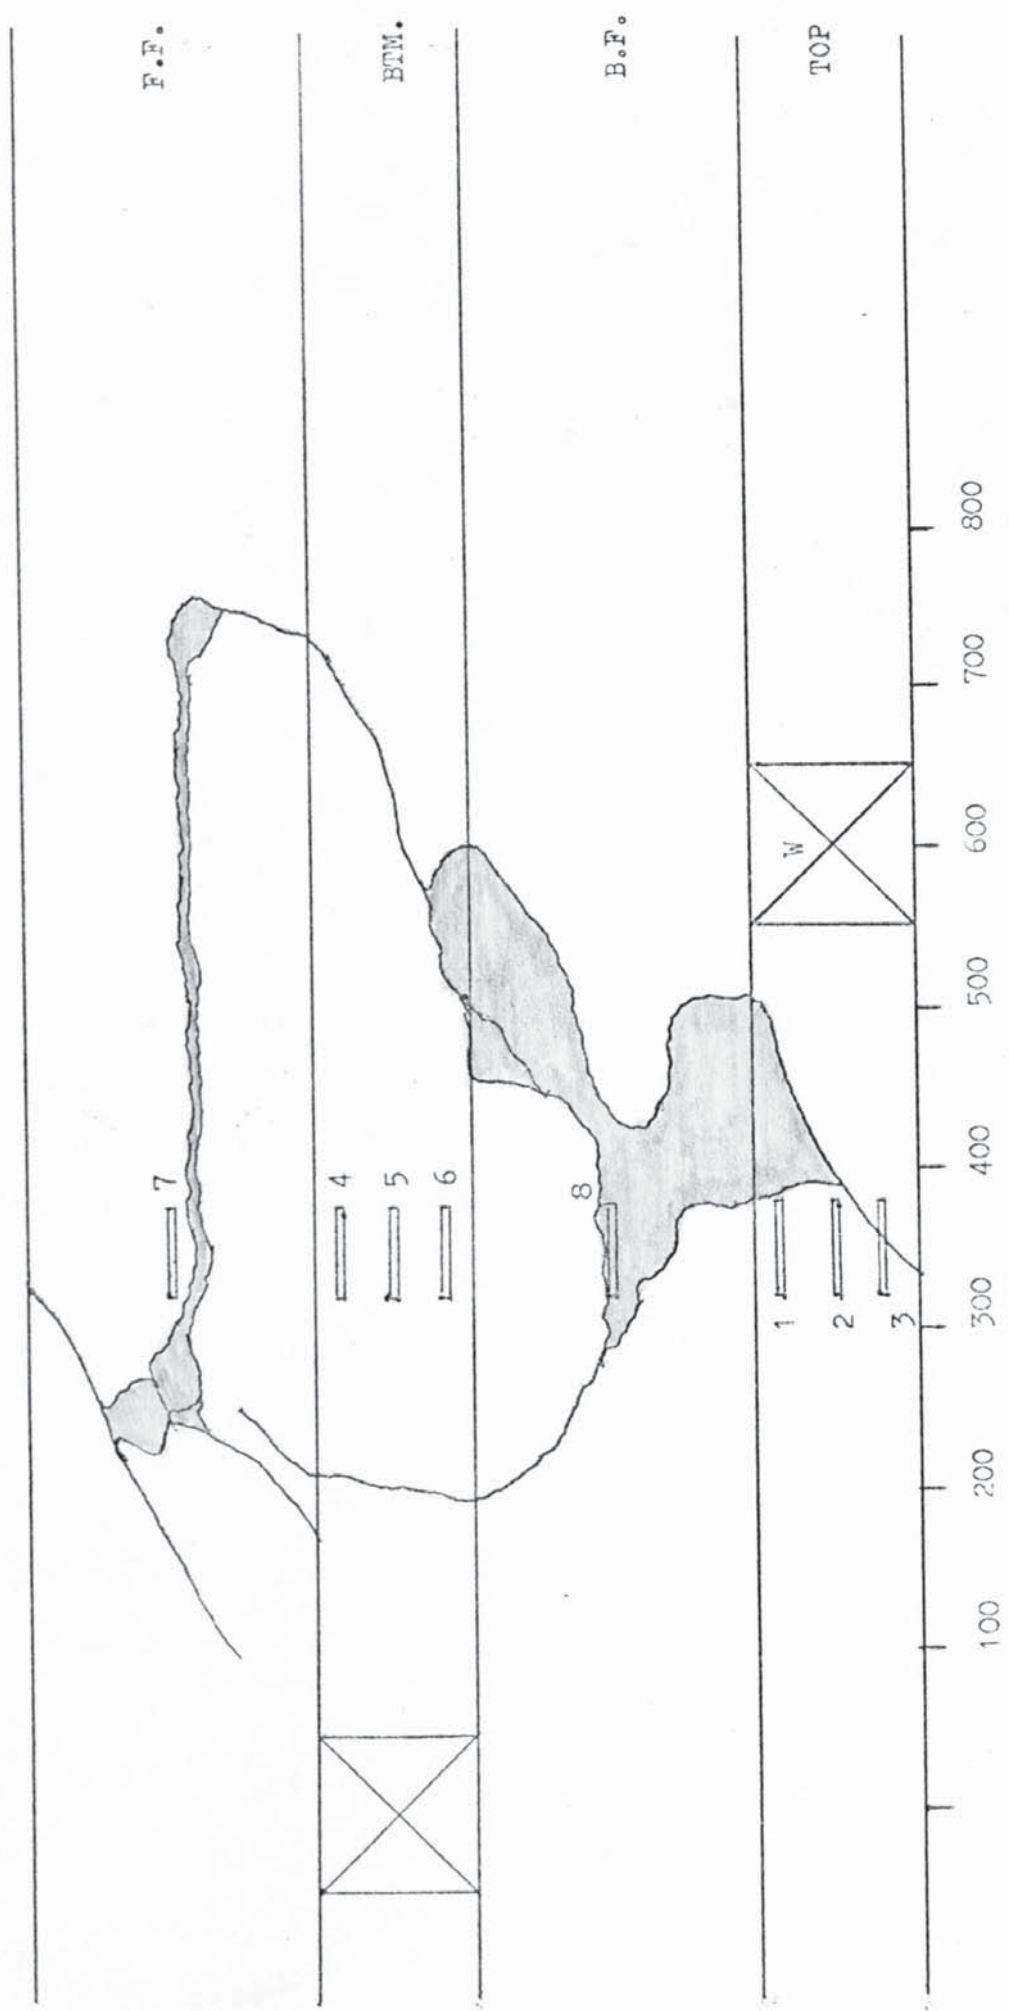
FAILURE CRACK PATTERNS - BEAM 4 (MODE 2)
